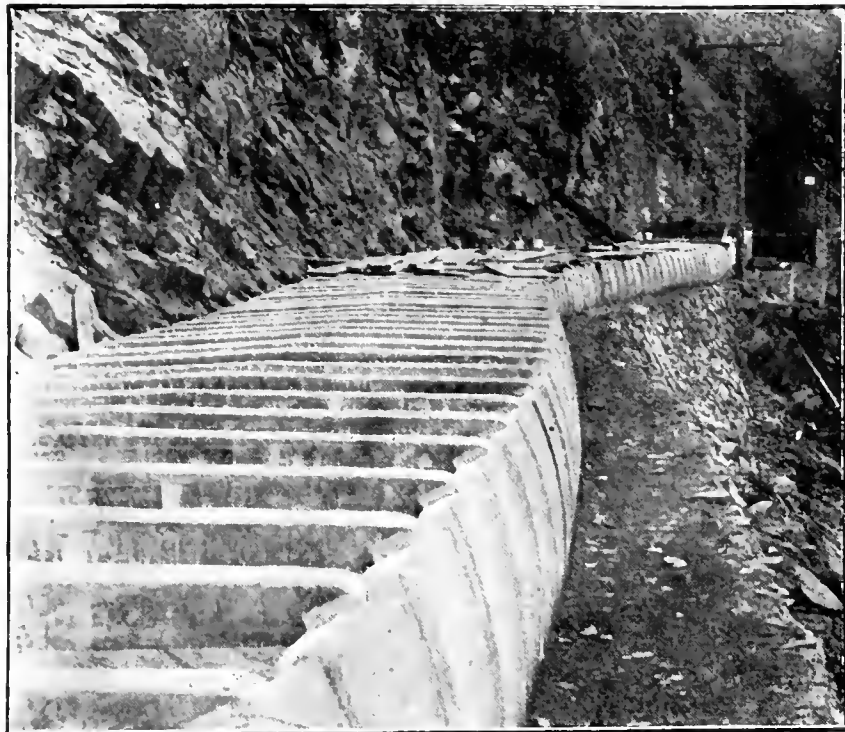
ORIGINAL CANAL SECTION AS COMPLETED IN 1909
